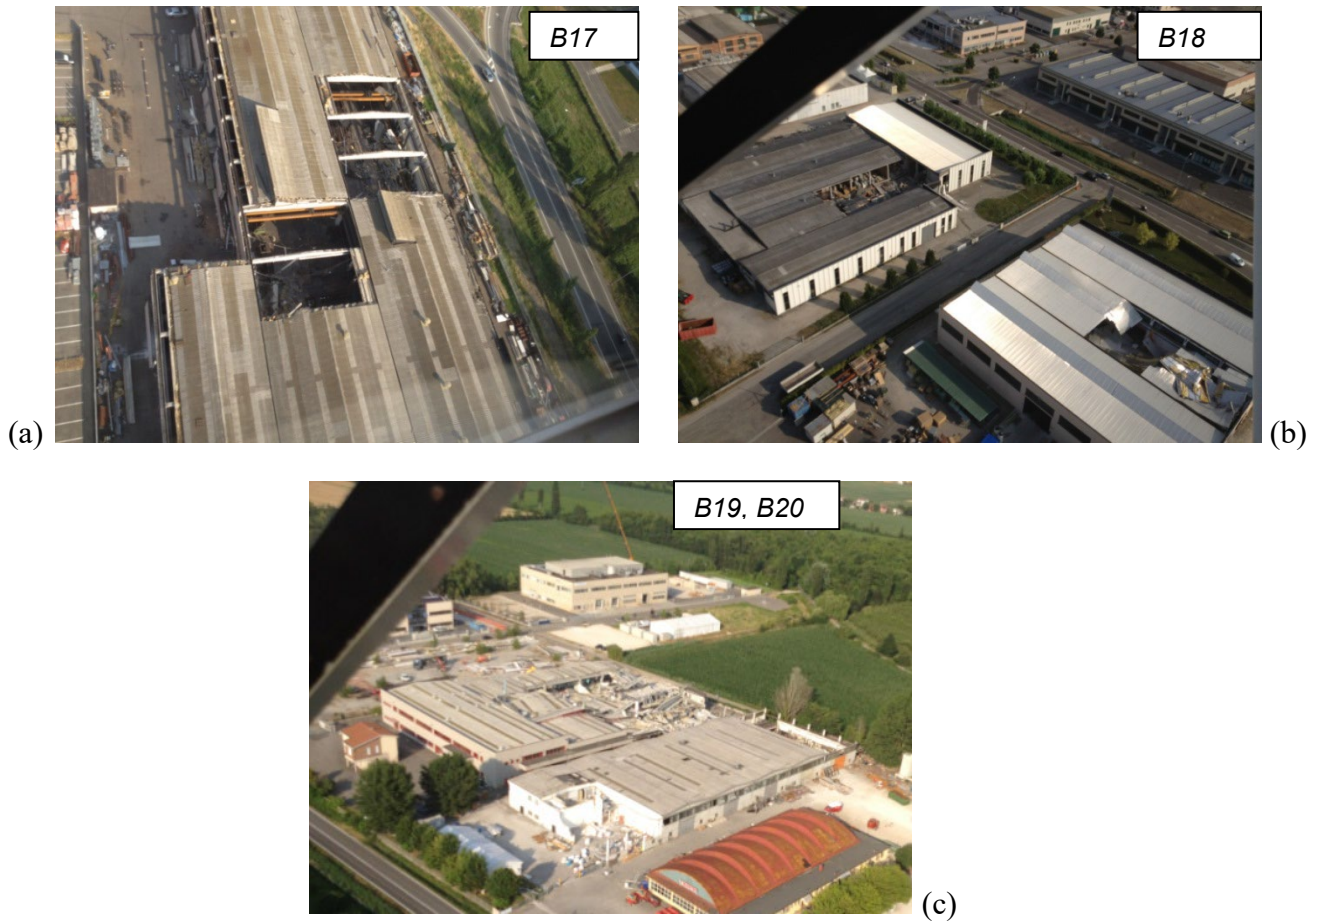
Failures of roof elements, often located in irregular portion of buildings.
